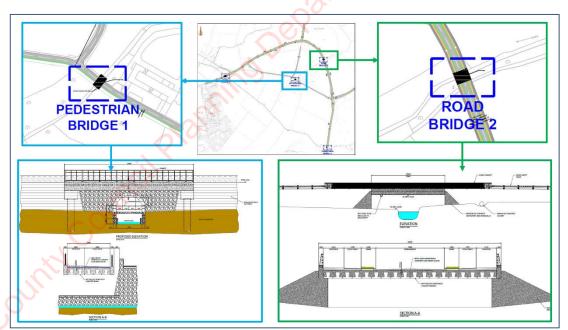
Proposed Bridges along the route of the MOOR – Imagery extracted from Planning Drawings (OCSC, 2022)
